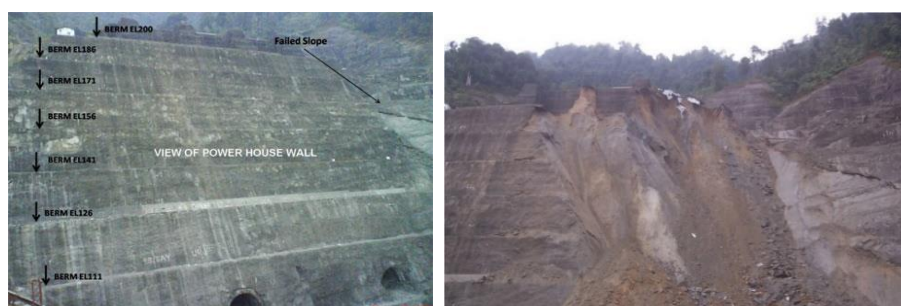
A view of power house slopes (a) before failure and (b) after failure
